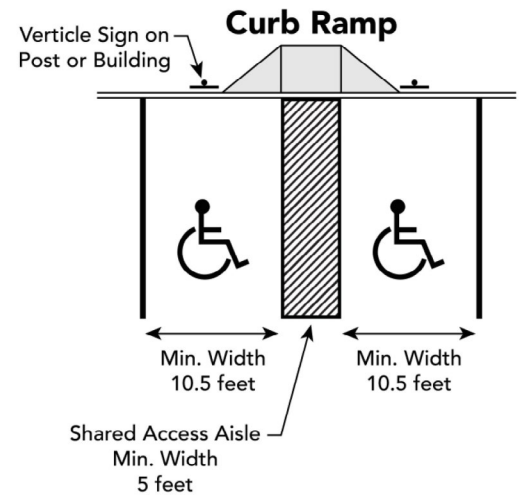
Accessible Parking Stall and Walk Aisleway Dimensions
